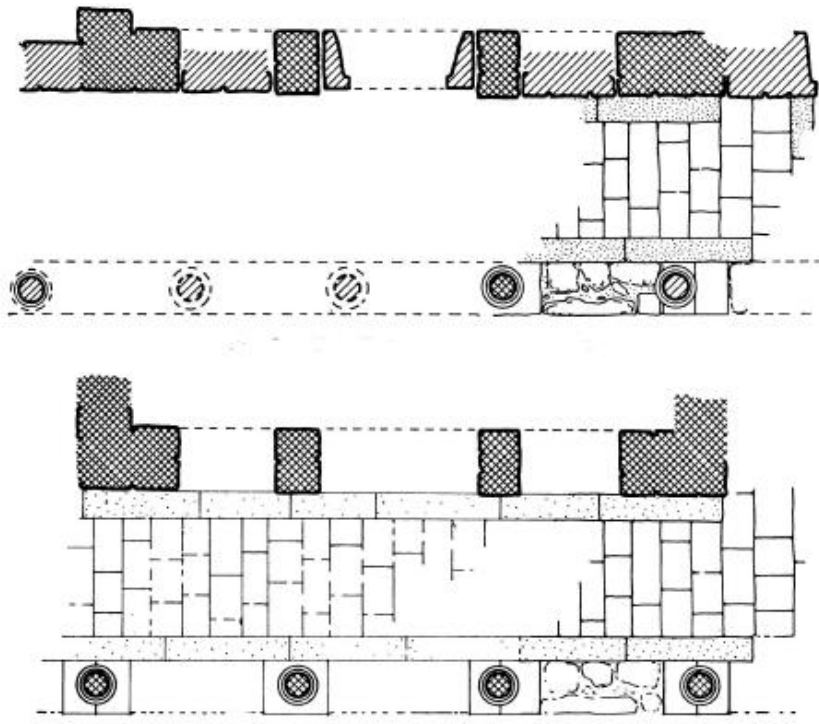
Corbett plan of doors part of Julianos church, shows the columns' row. Scale 1:50
